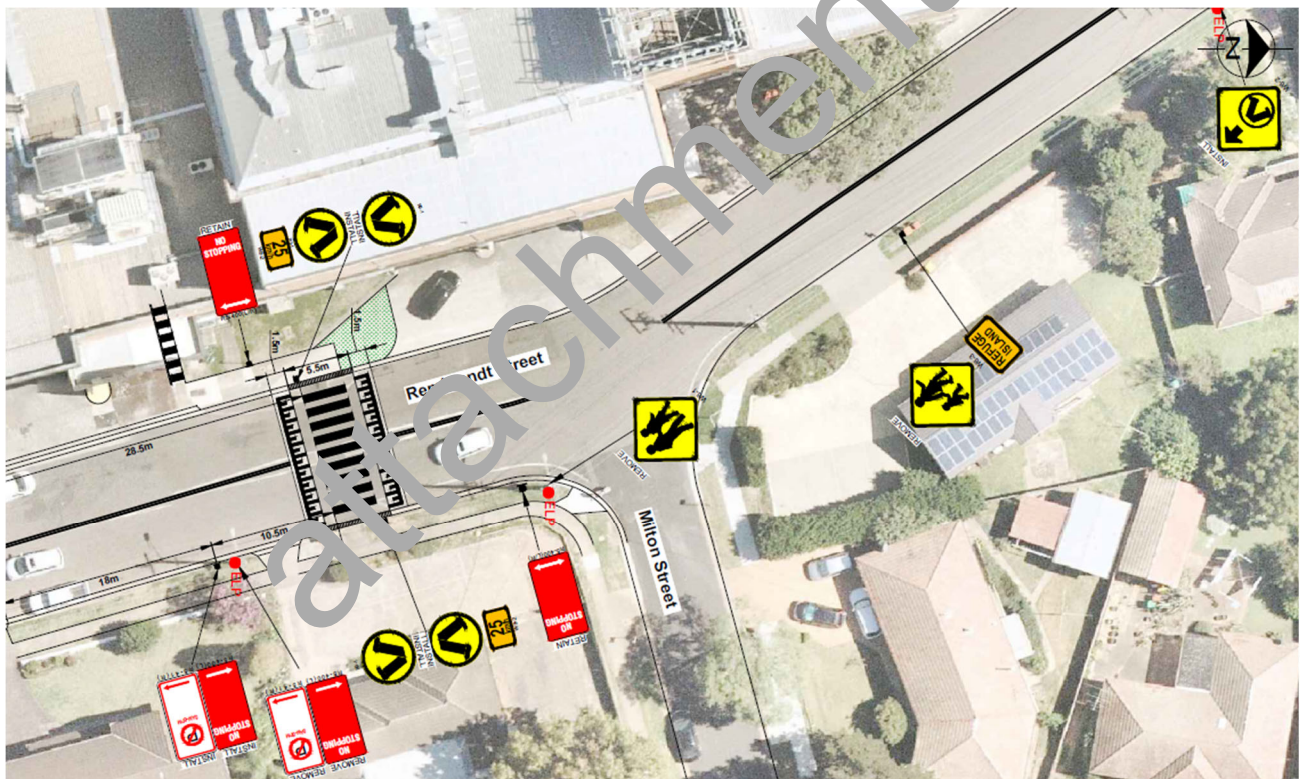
A concept plan showing the proposed raised pedestrian crossing in Rembrandt Street south of Milton Street, Carlingford
